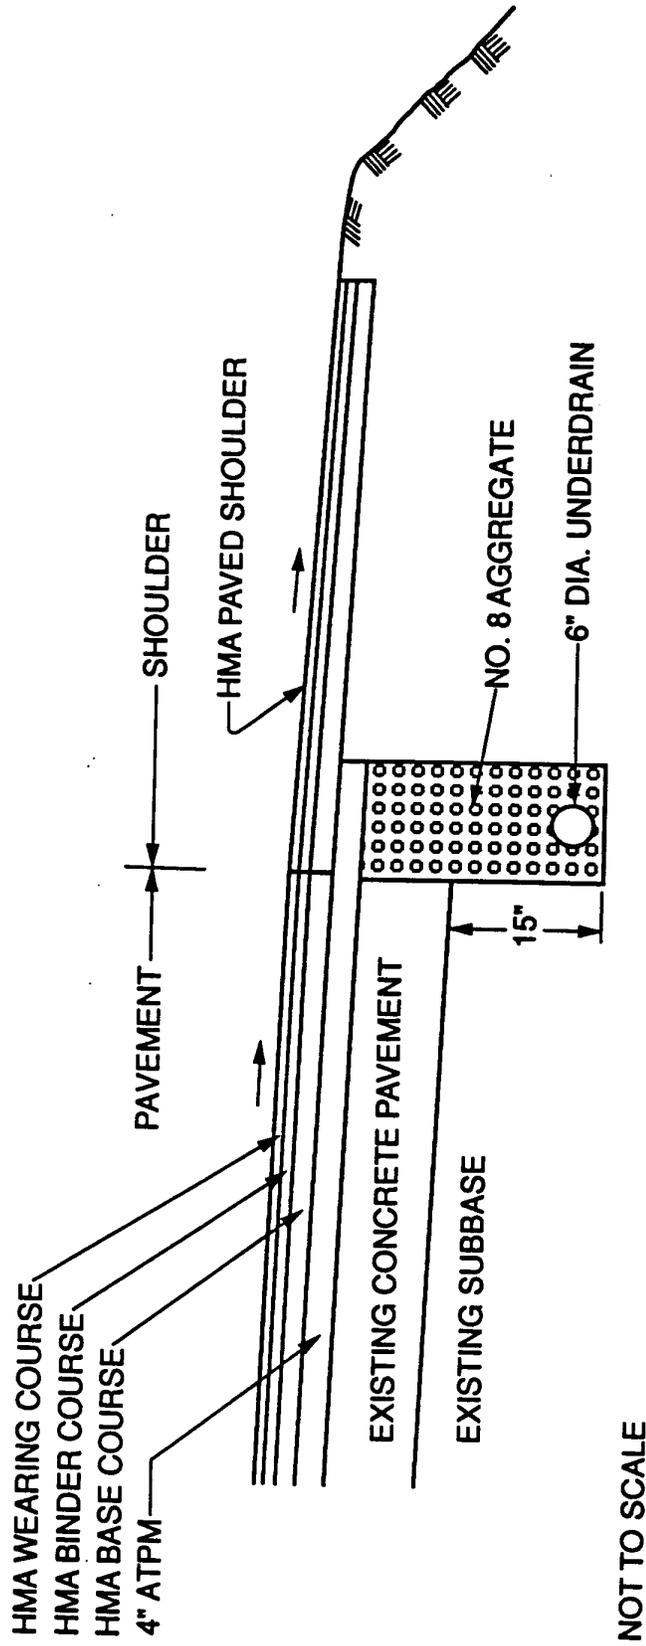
Use of ATPM between existing concrete pavement and HMA overlay
